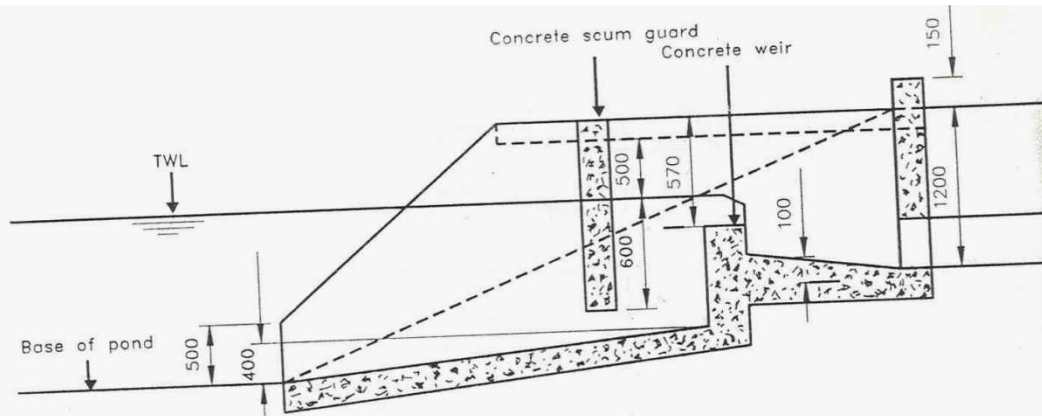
Outlet Weir Structure. The weir length from equation 12.27. The discharge pipe would connect with the inlet structure shown in 12.9
